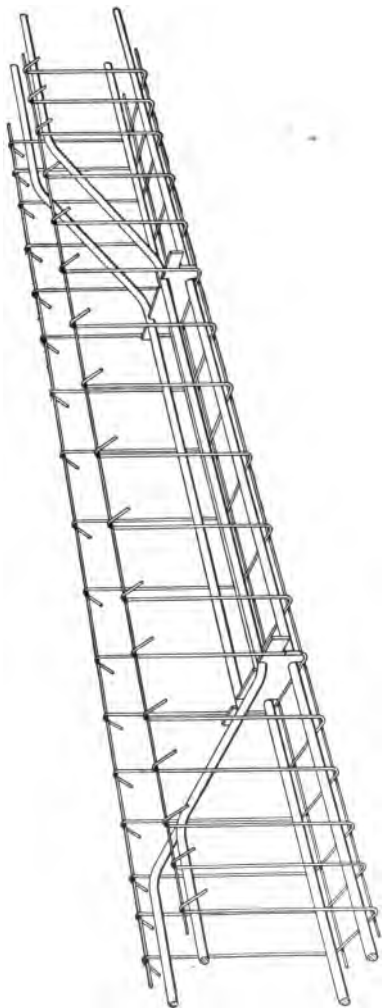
Design of Collapsible Reinforcing Bar Unit Frame
